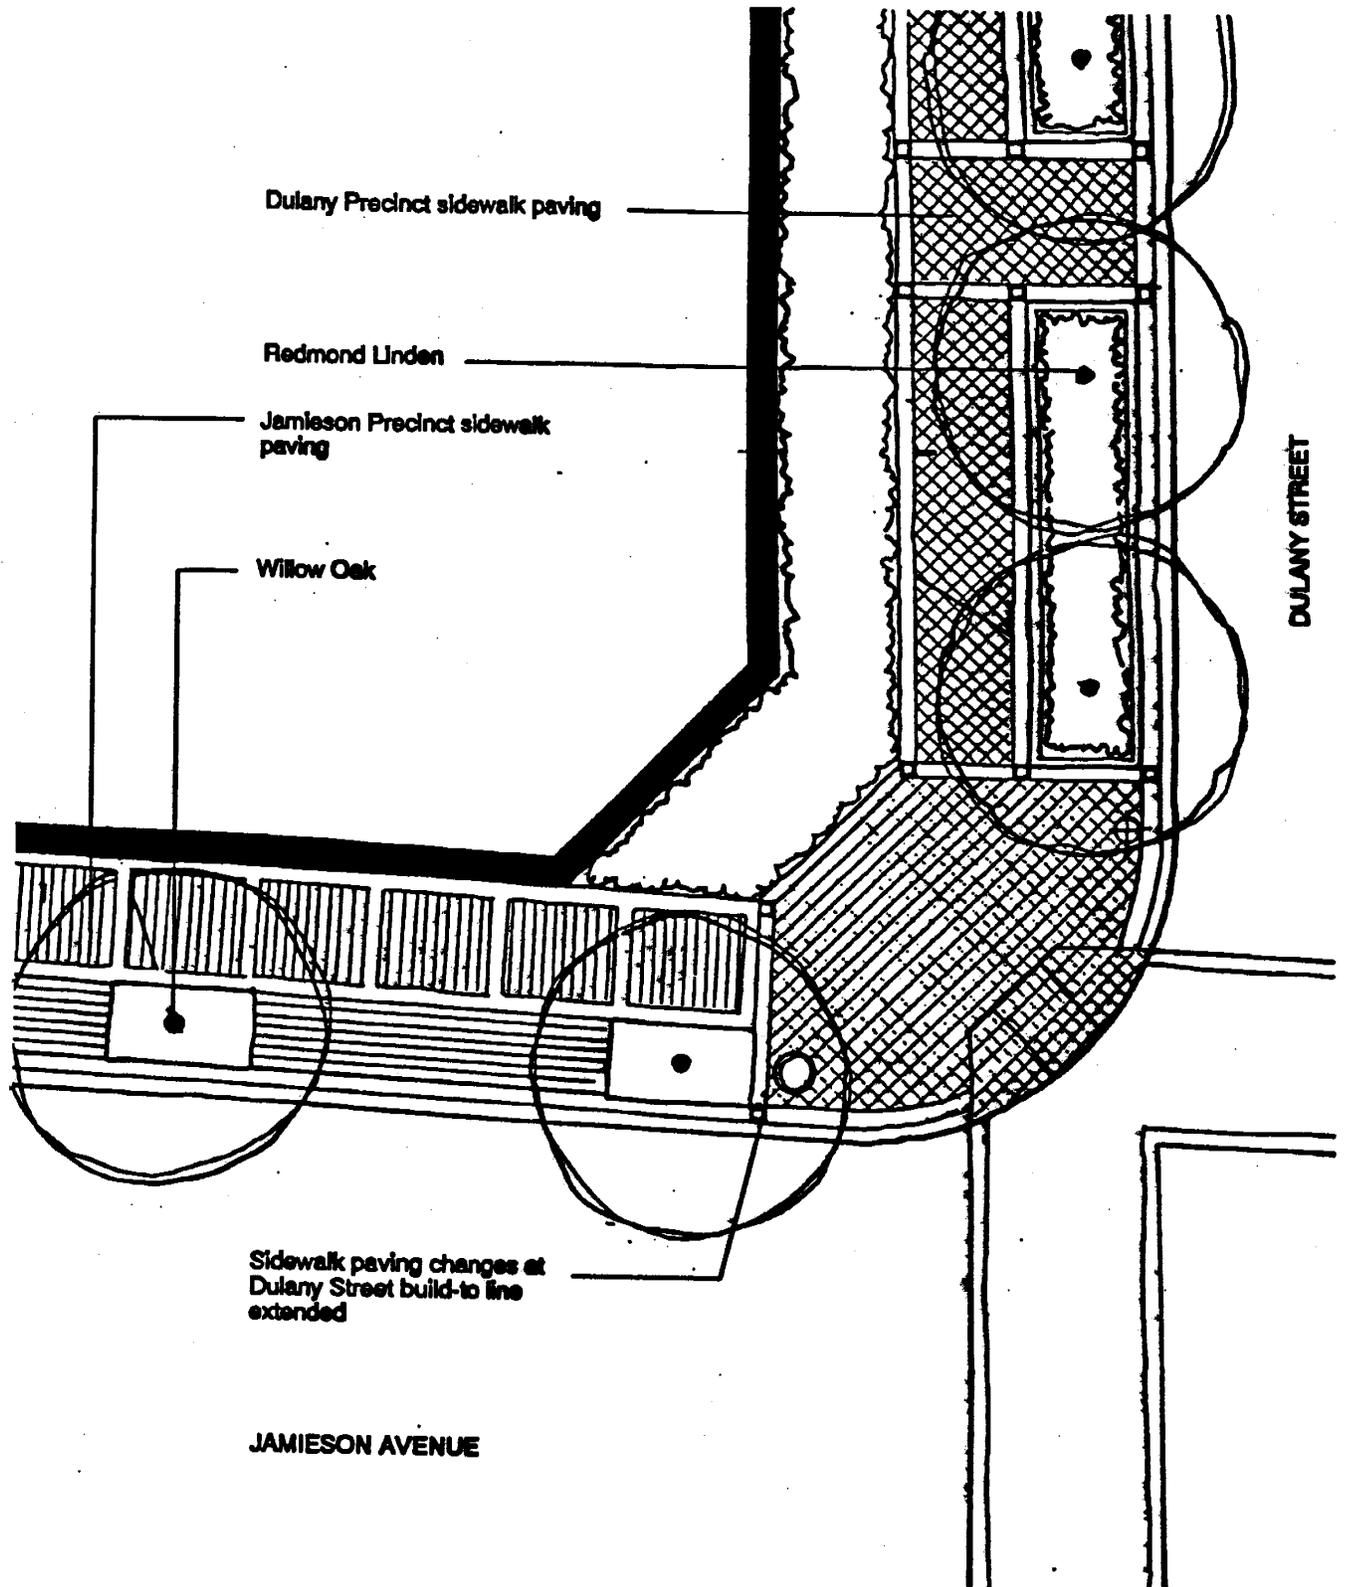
Dulany Precinct Transition at Jamieson Avenue
